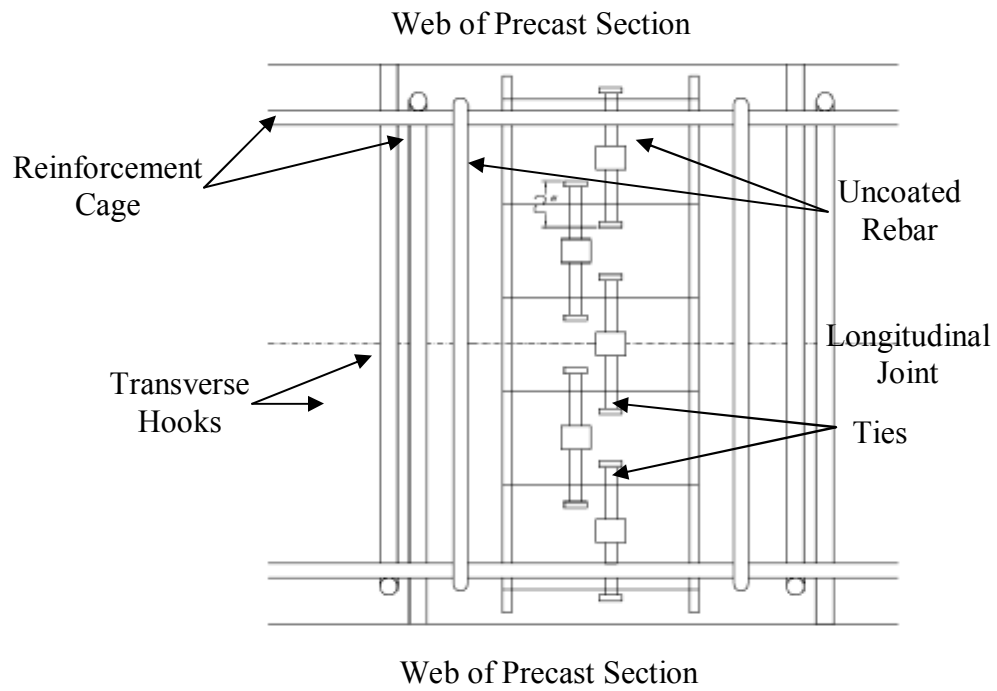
Plan view of instrumentation detail for VW embedment strain gages located directly above precast longitudinal joints
